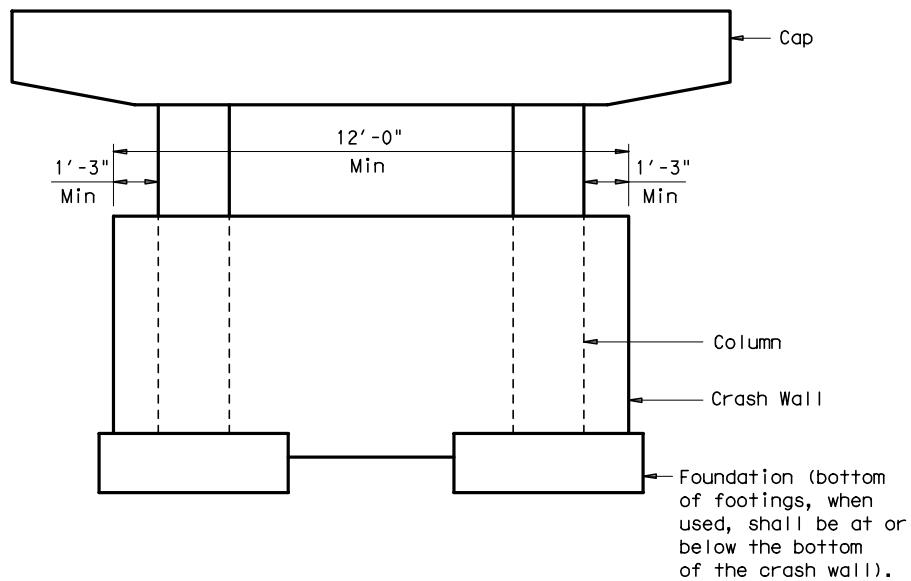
Railway Crash Wall Parameters for Multi-Column Bent. Online users can click 4-13 to view this illustration in PDF.
